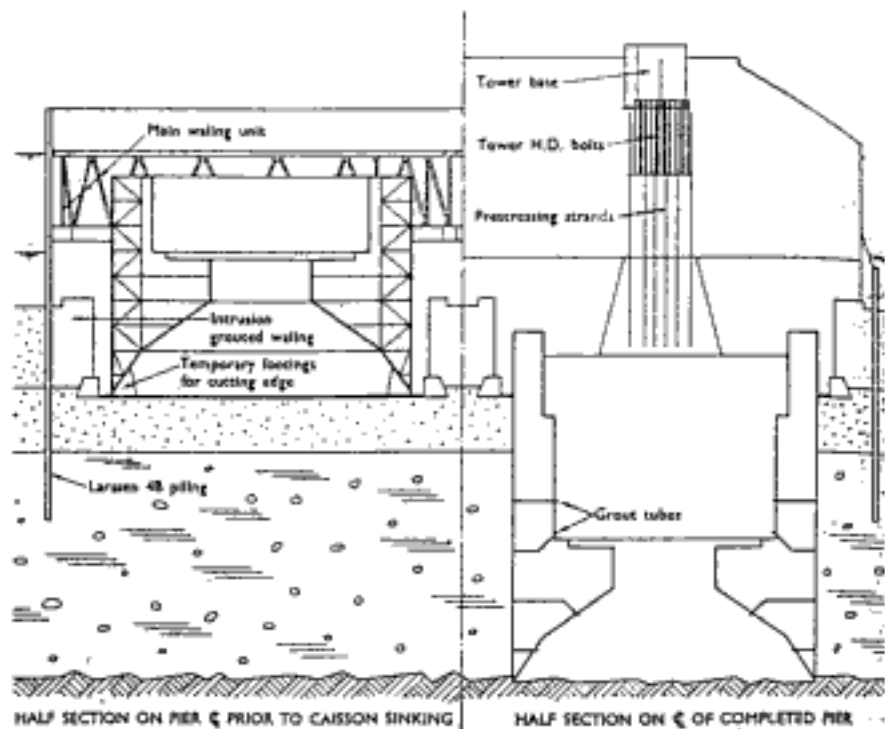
Forth Road Bridge, south pier construction: half-sections showing caissons during sinking and completed pier (Anderson²²)
